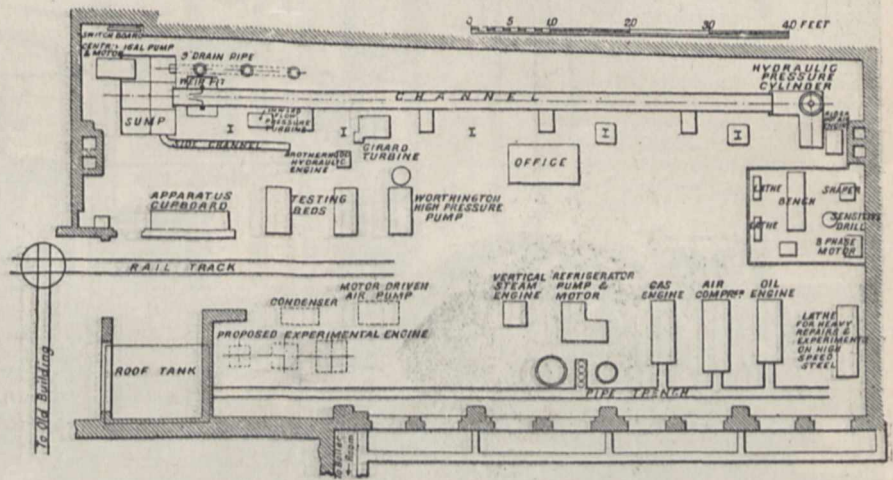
Plan of the Engineering Laboratory at the City and Guilds Technical College, Finsbury.
